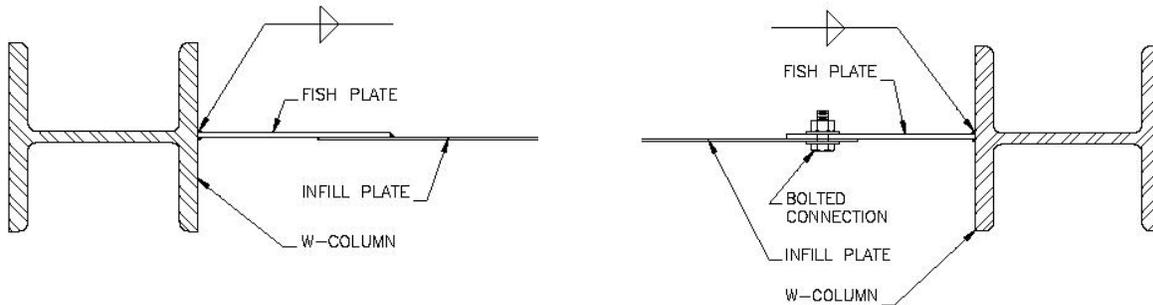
Typical "fish plate" to boundary frame and infill plate to "fish plate" connections
